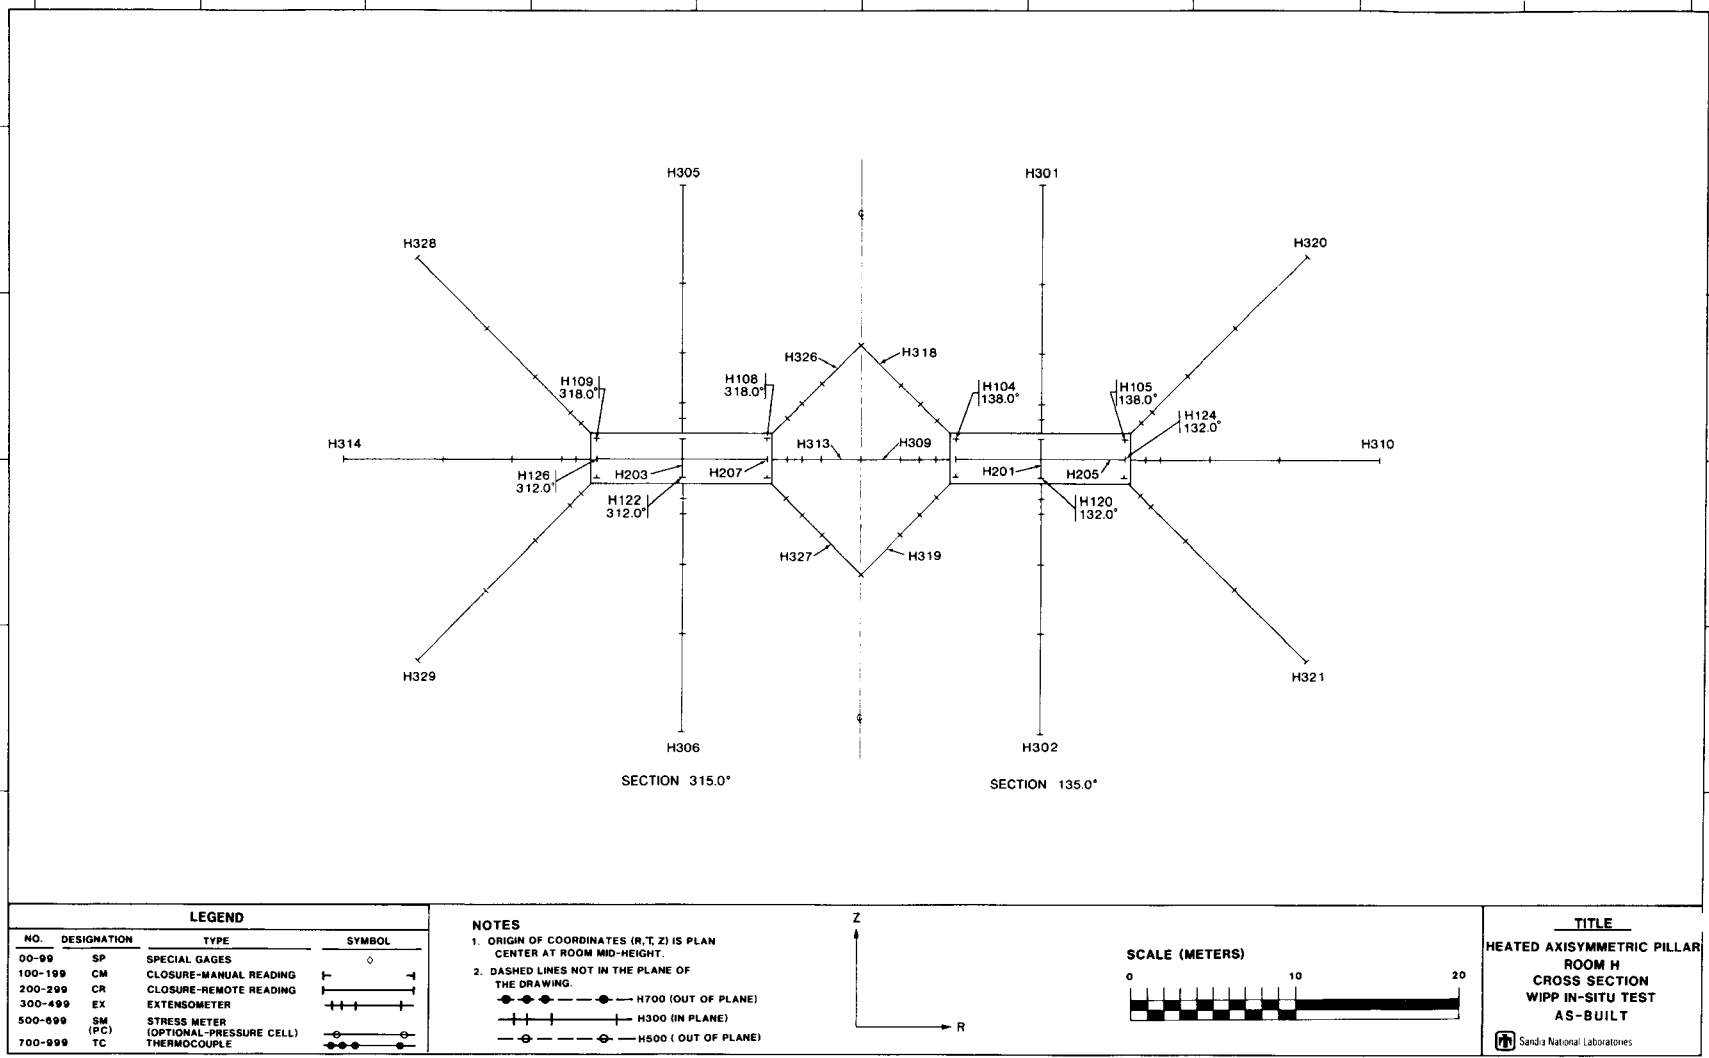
Cross Section of 135° and 315° Instrument Stations
